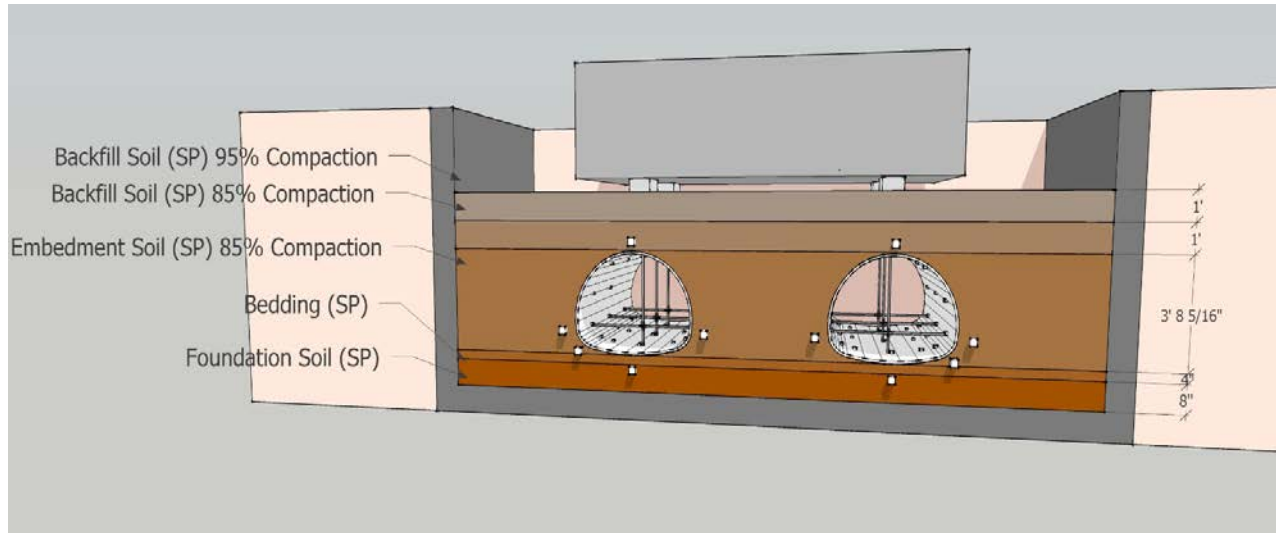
Soil Box Test 3D View (Pipe Arch Shapes)
